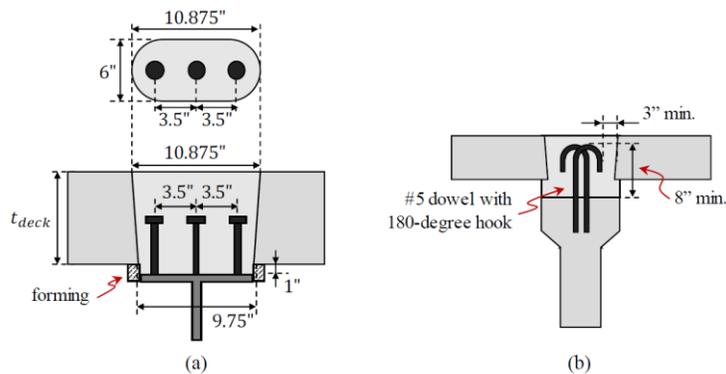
27 Examples of shear pocket and connector details for (a) steel plate girders and (b) prestressed concrete girders [60].
